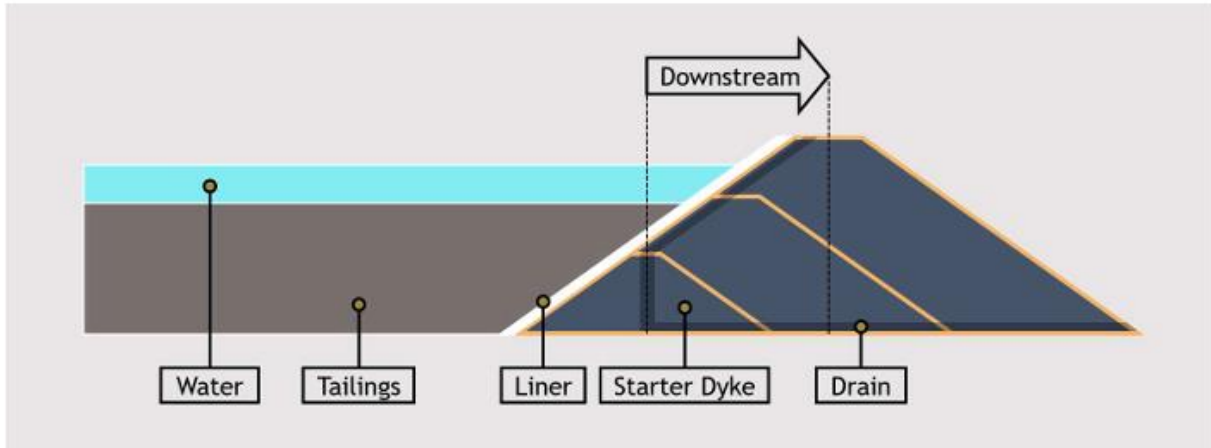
Downstream Tailing Storage Facility design (Yanama Gold, 2023)
